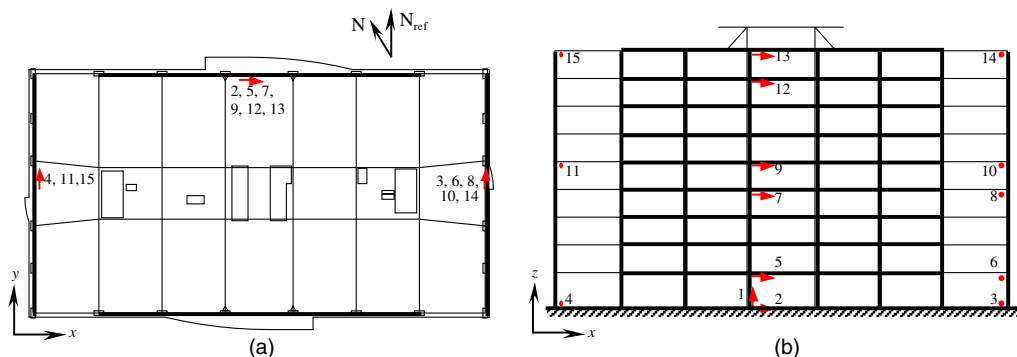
Locations of accelerometers in the nine-story symmetric-plan building: (a) plan view, and (b) south elevation.
